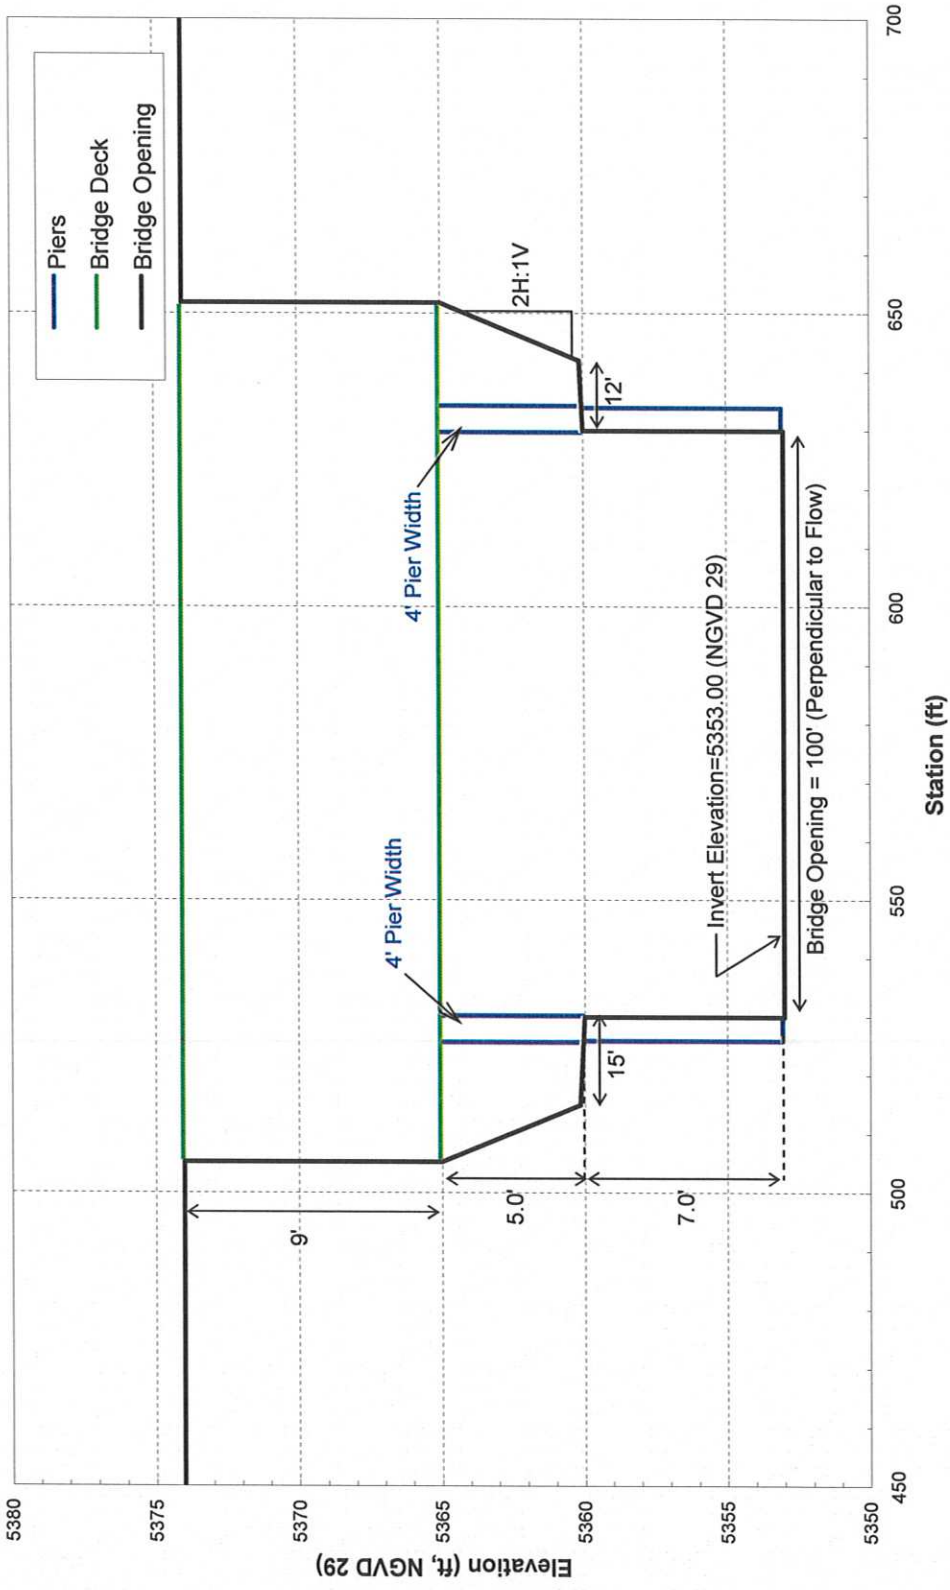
Cross-sectional geometry at the upstream face of the proposed McMahon Boulevard bridge opening.
